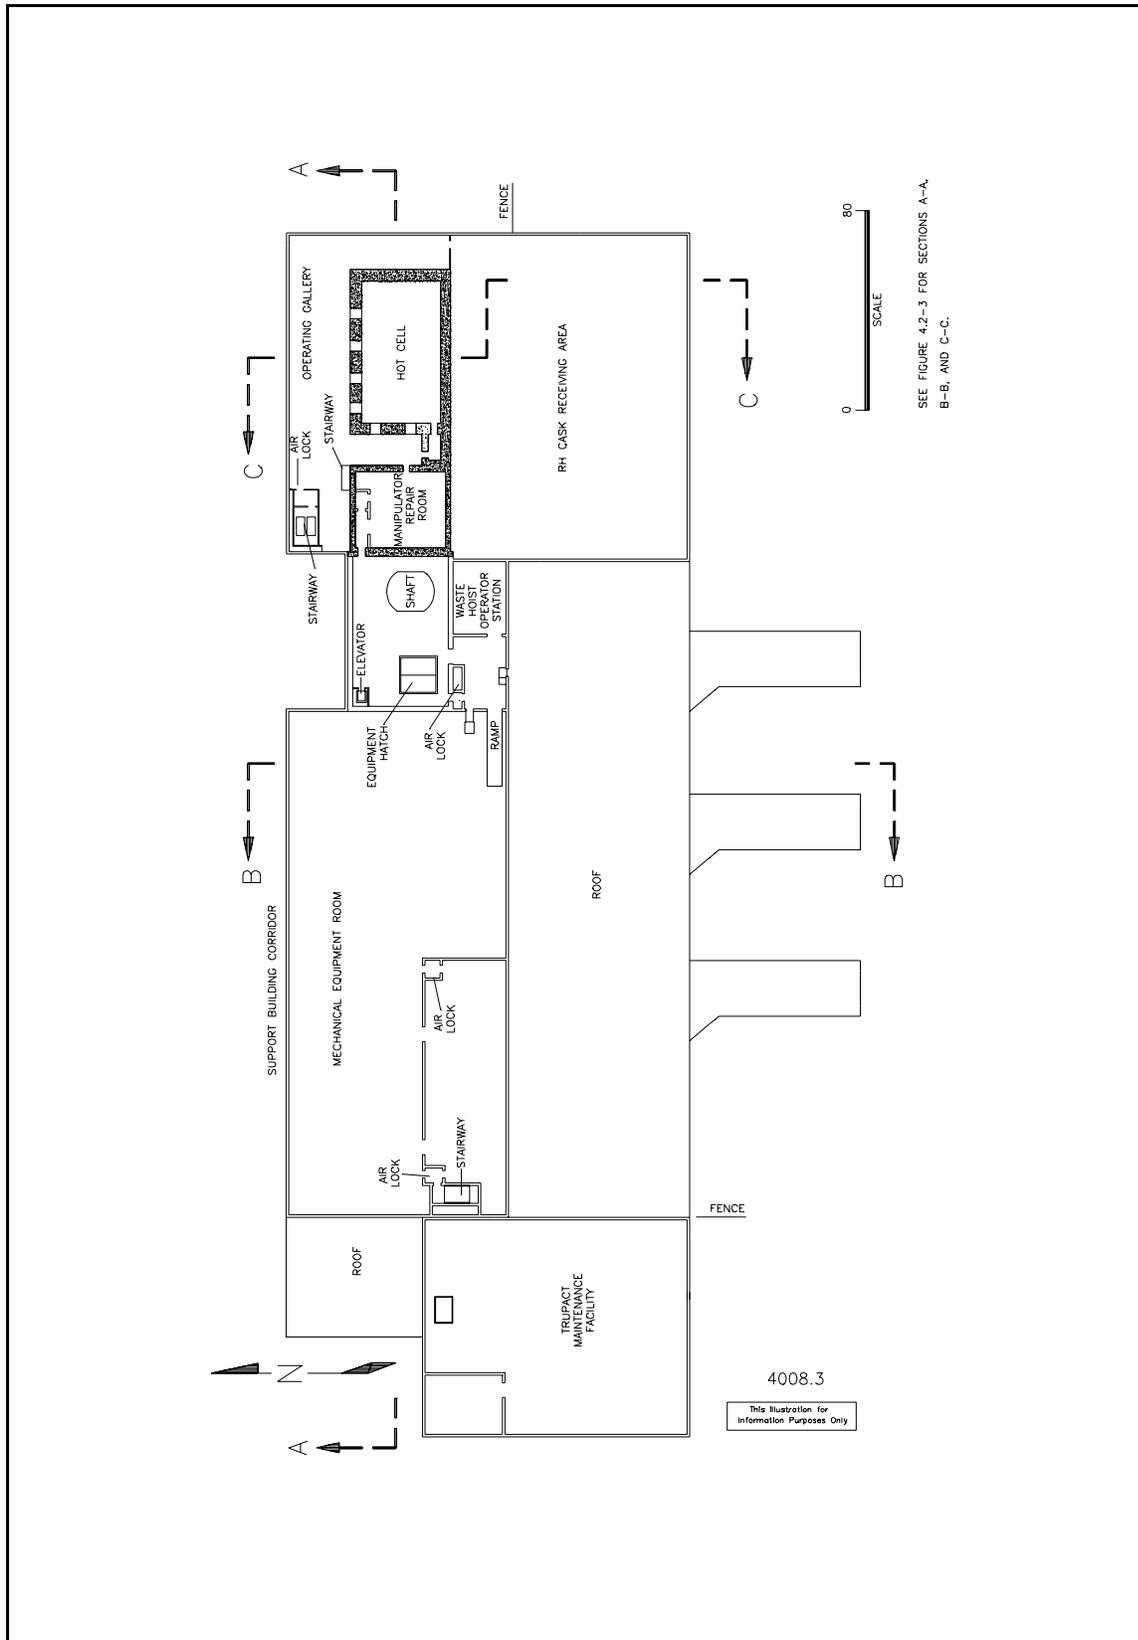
, Waste Handling Building Plan (Upper Floor)
